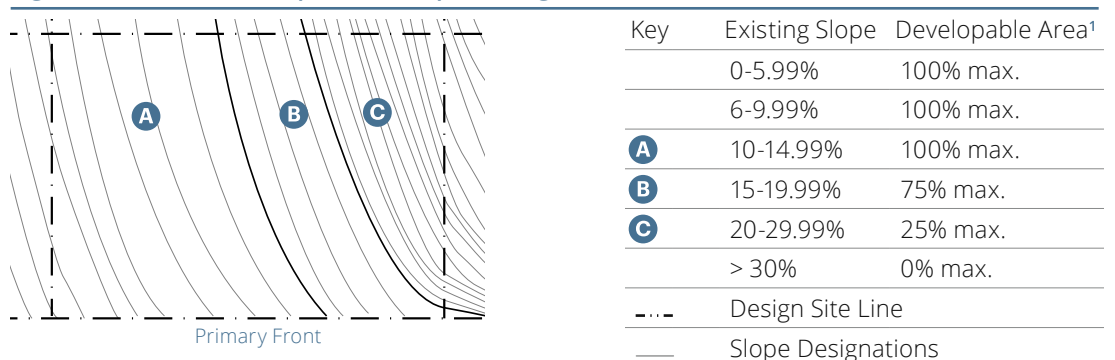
Example for Defining Sloped and Steeply Sloped Design Sites
